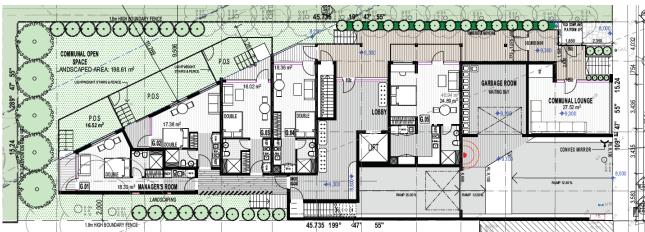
Extract of the ground floor plan refused as part of the original application DA 2018/067
